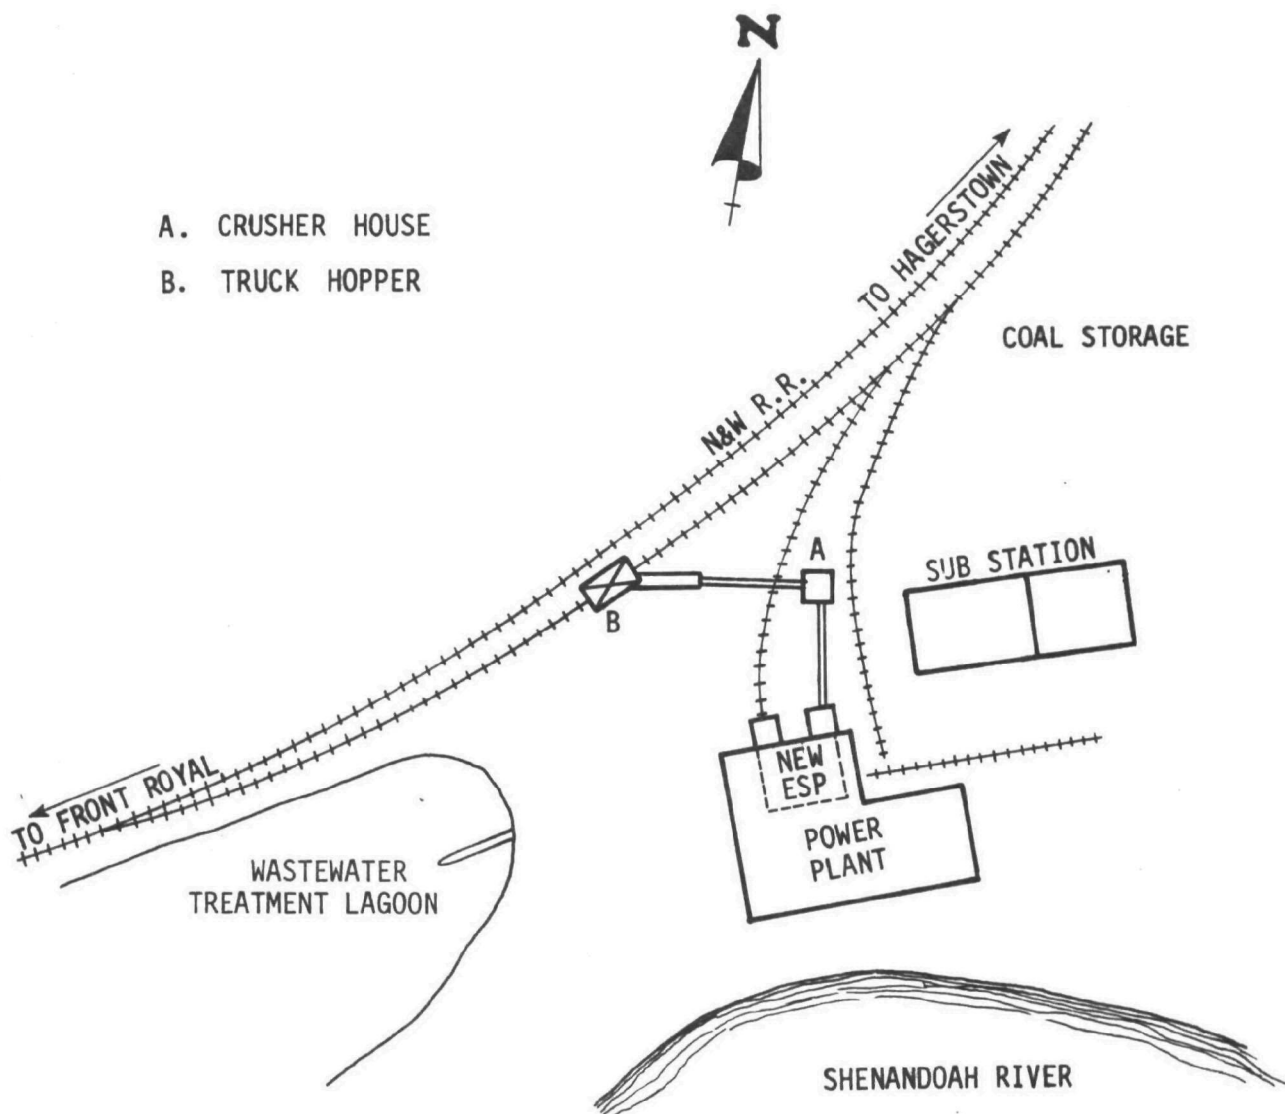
Site plan showing possible location of a new ESP for Boiler 1 at the Riverton power plant.
